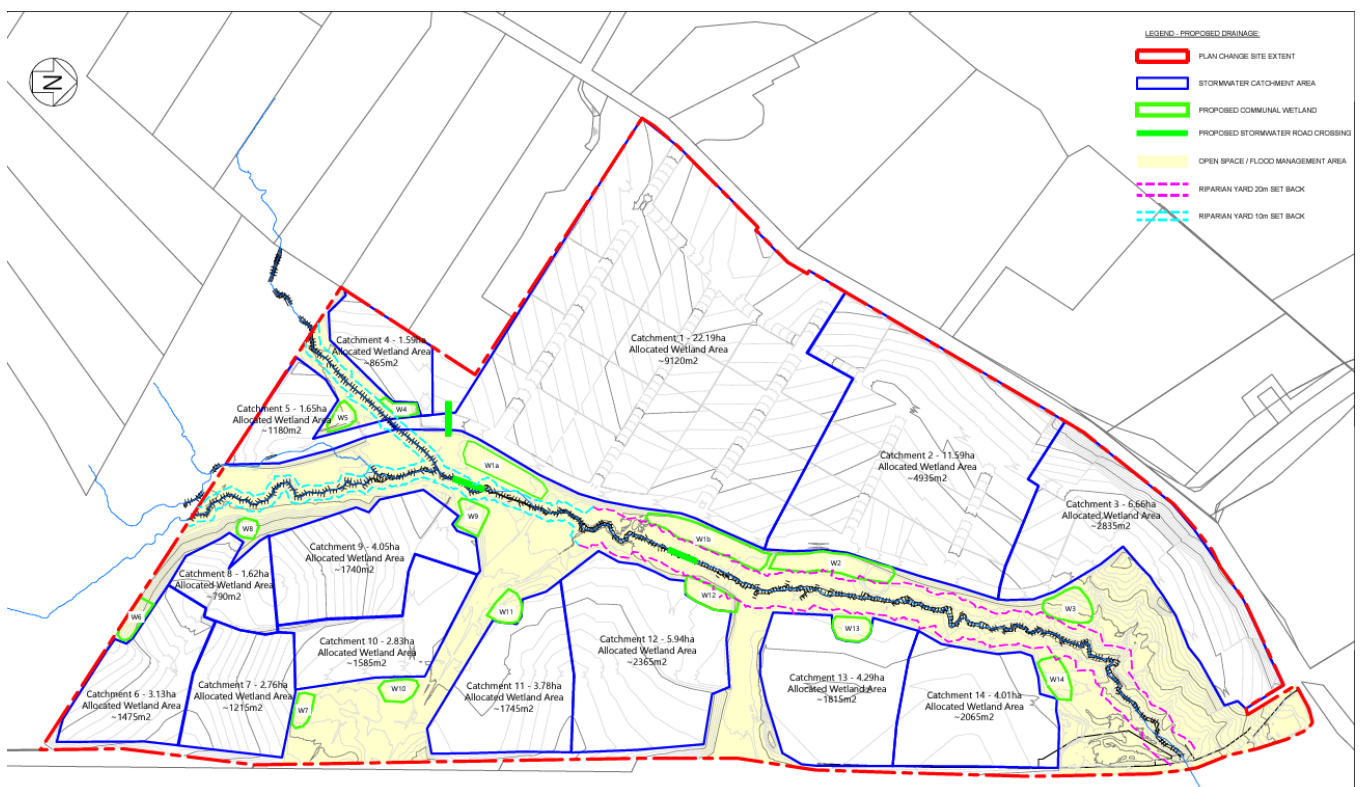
Plan of locations of 15 proposed stormwater wetlands, Drawing 3001, dated 21 May 2024, in the Silverdale West Plan Change Stormwater Management Plan, 2024
